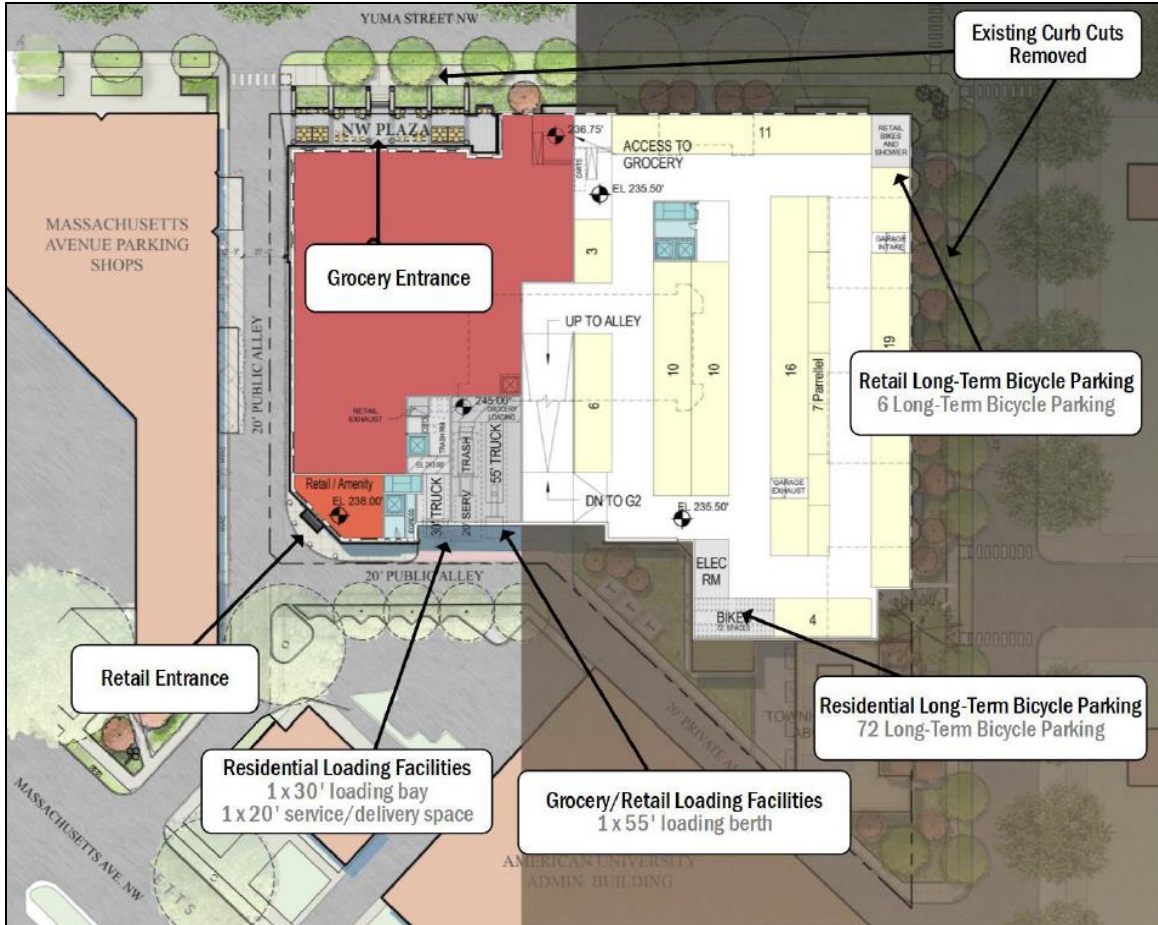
Site Plan (Source: CTR, Gorove/Slade, Figure 7, 8/23/19)
